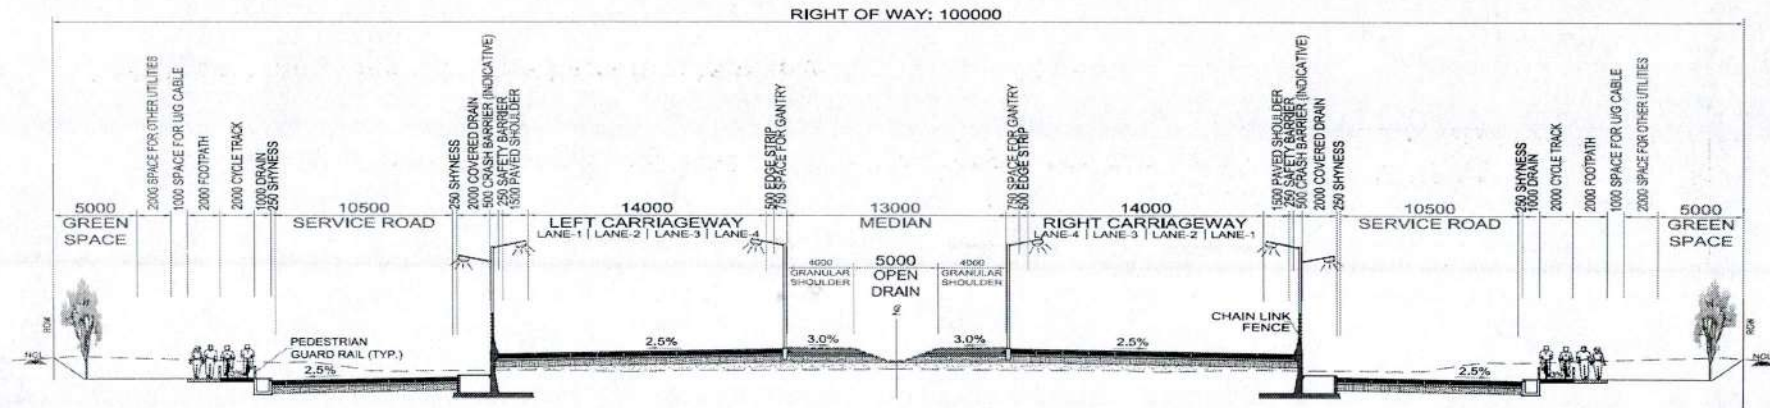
Typical Cross Section – Service Road lower than Main road
